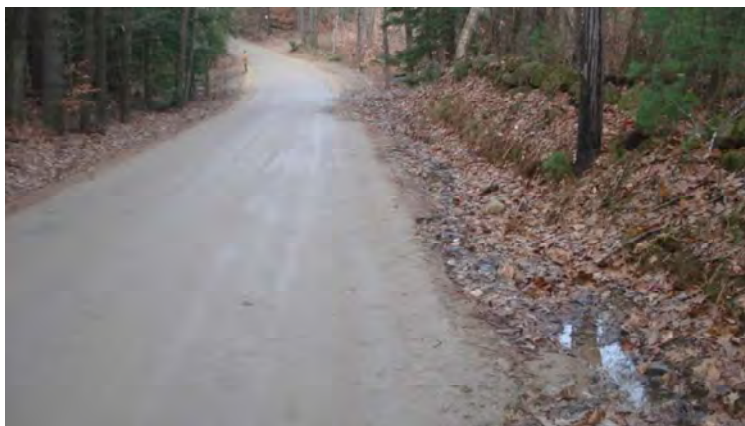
Kaulback Road, Looking North Toward Black Brook – Swale Improvement (BMP 18)
